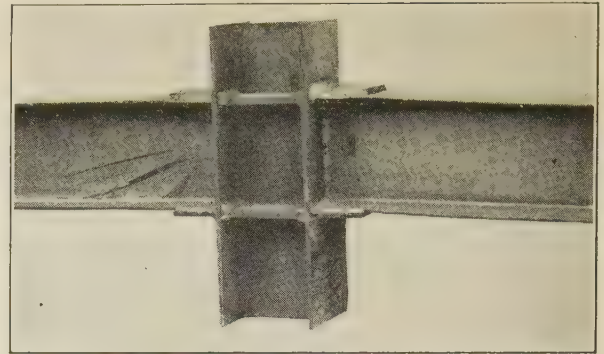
WELDED BEAM CONSTRUCTION
